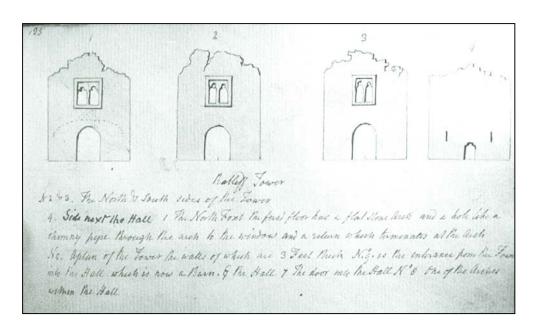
Captain Dewhurst's drawings of the tower from 1784. Bolton Archives ZZ/442/1.
